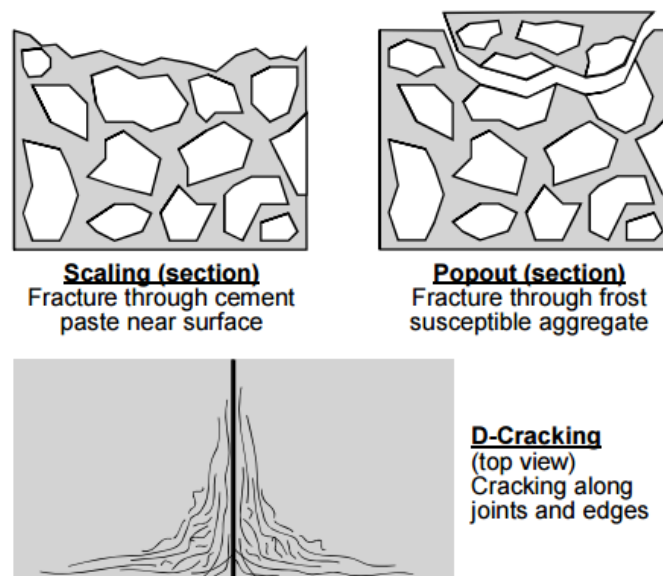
Forms of Freezing and Thawing Damage to Concrete [31]
